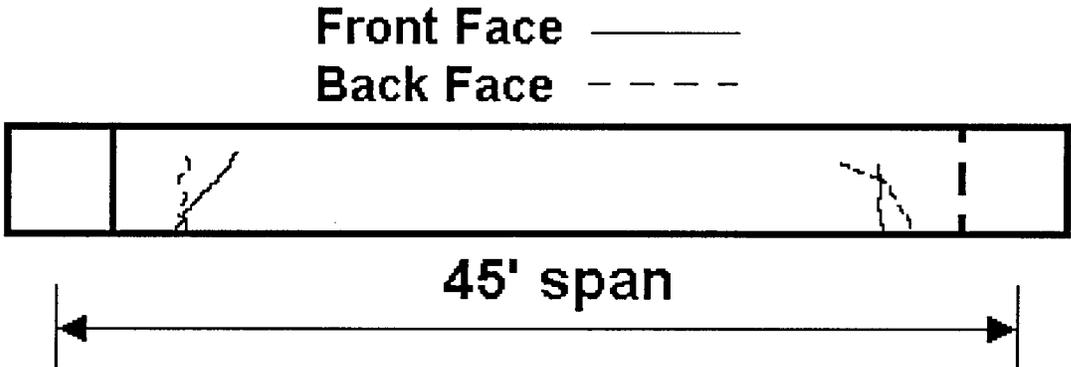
Typical Crack Patterns - Beams # 7, 8, 9.
